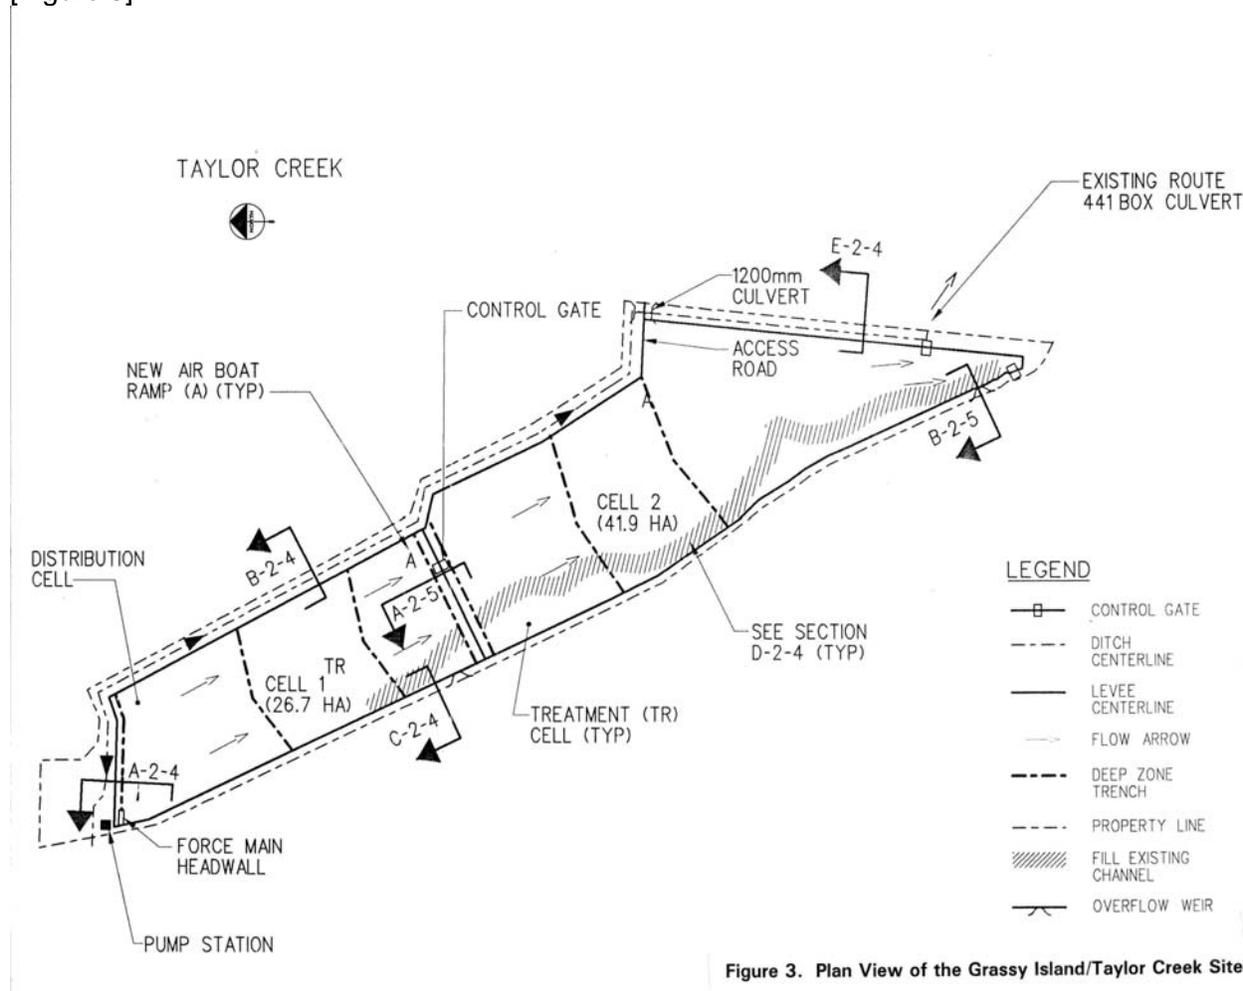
Plan View of the Grassy Island/Taylor Creek Site
